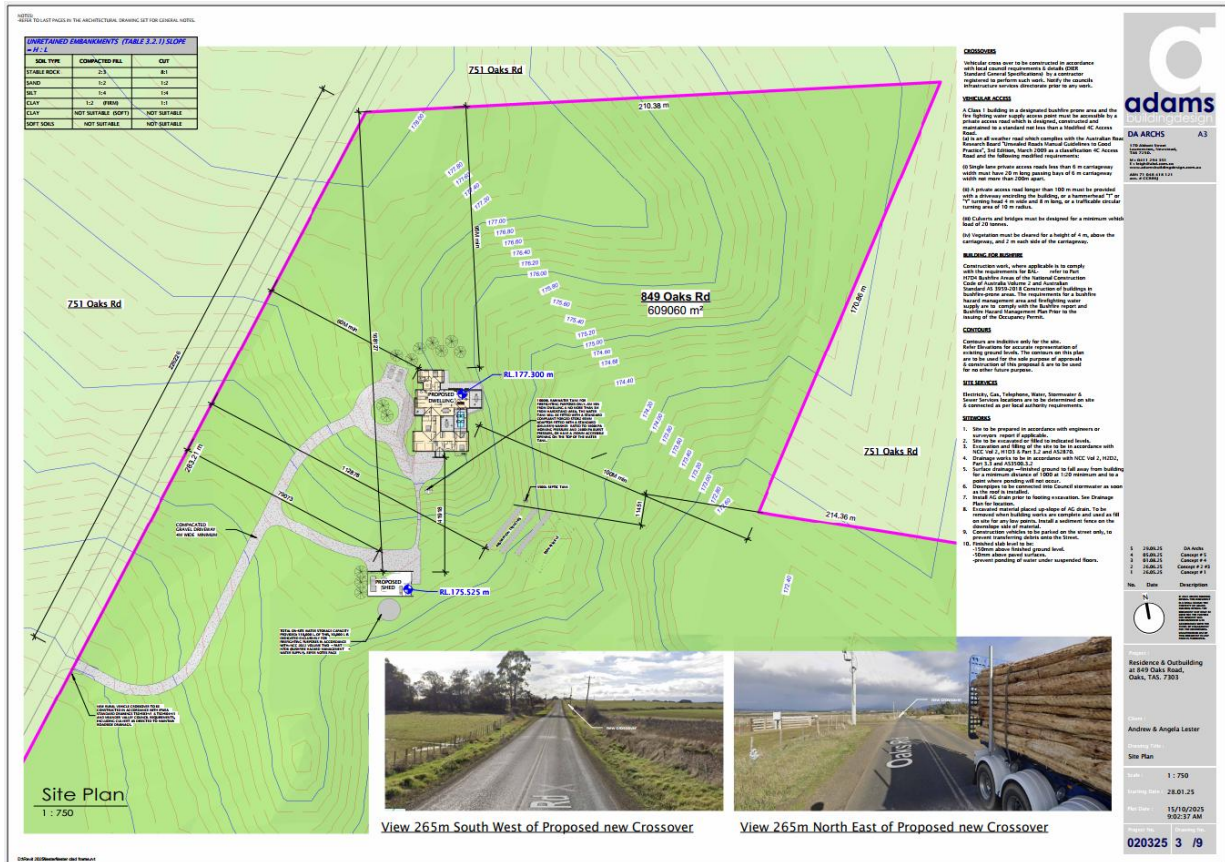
Proposed residential dwelling layout on the subject property (source: adams building design, project no. 020325)
